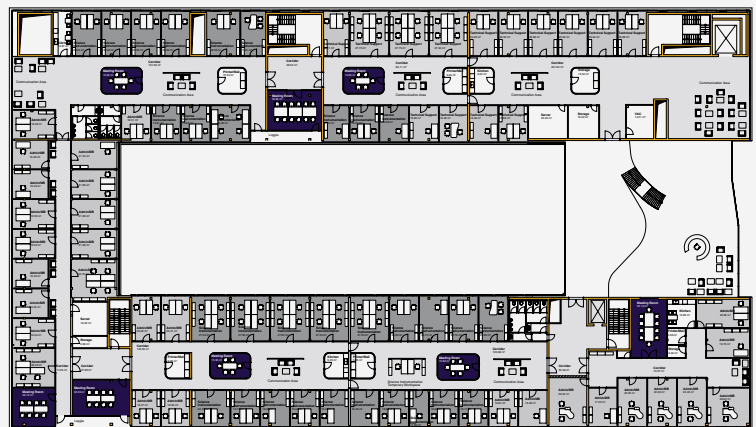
Cross-sectional view of the second floor of the office building (XHQ)
